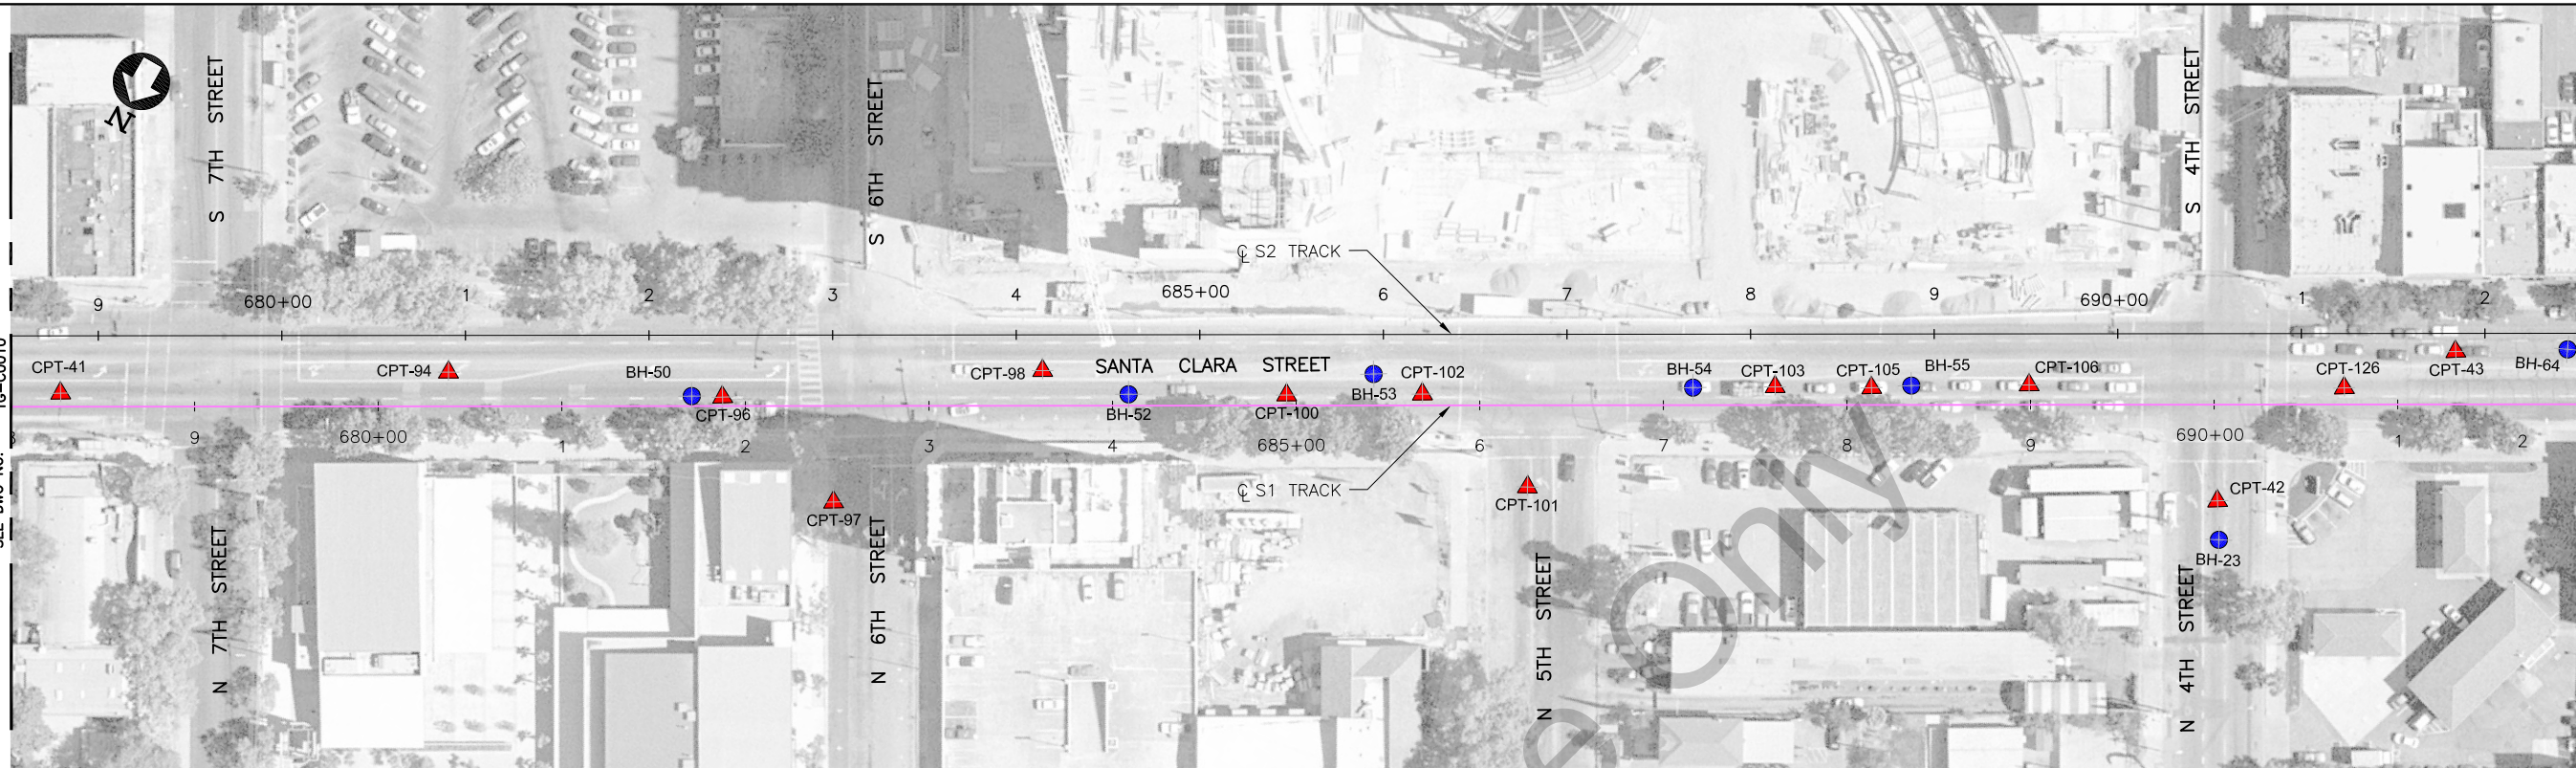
Geotechnical Plan and Profile with Strength
